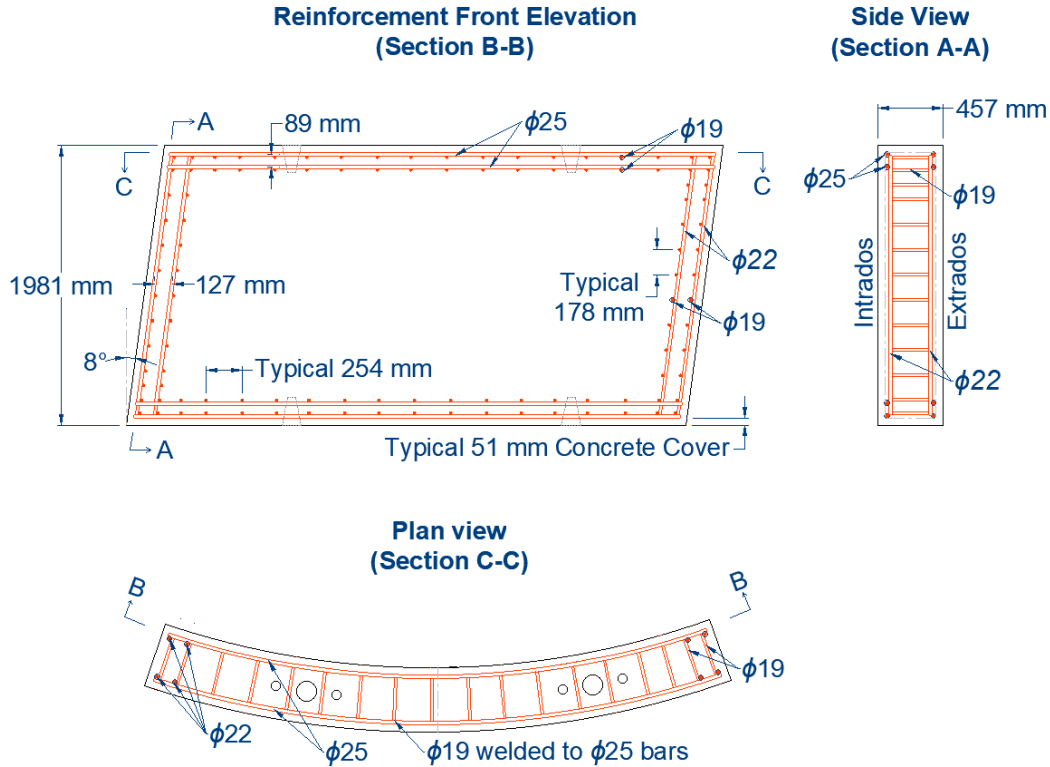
Layout and detailing for steel reinforcing bars in the hybrid segments
